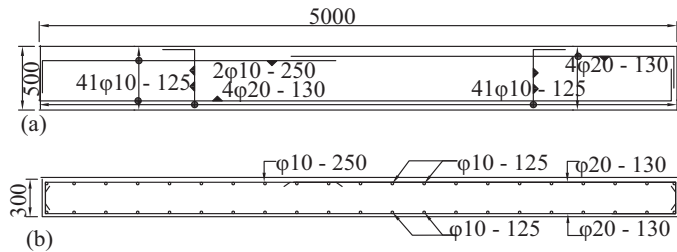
Reinforcement layout for slab strips: (a) top view of BS1; (b) cross section of BS1 in [mm]
